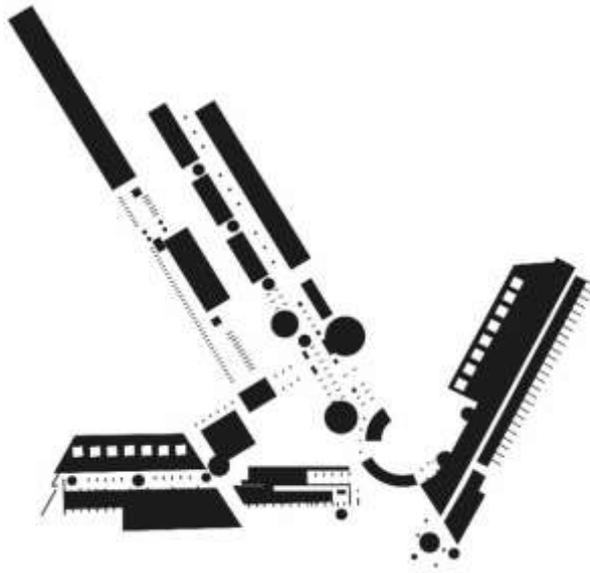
Figure ground expression of Gallaretese 2 ground floor plan
